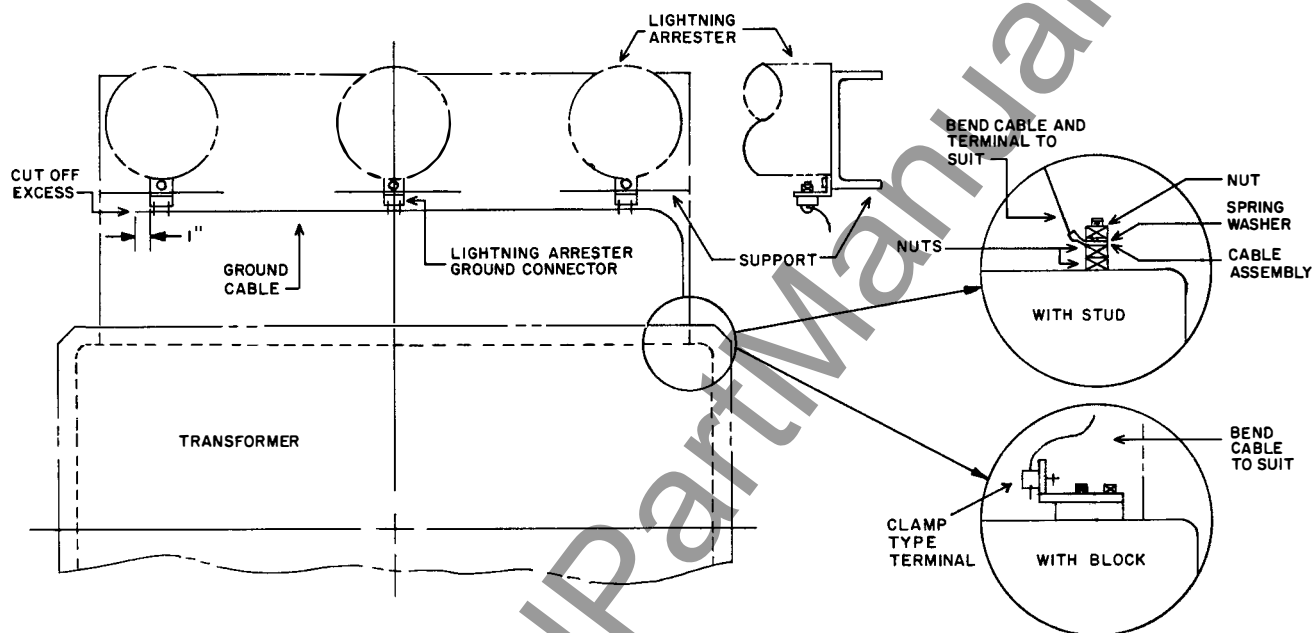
Detail of connections to be made when grounding lightning arresters on transformers
